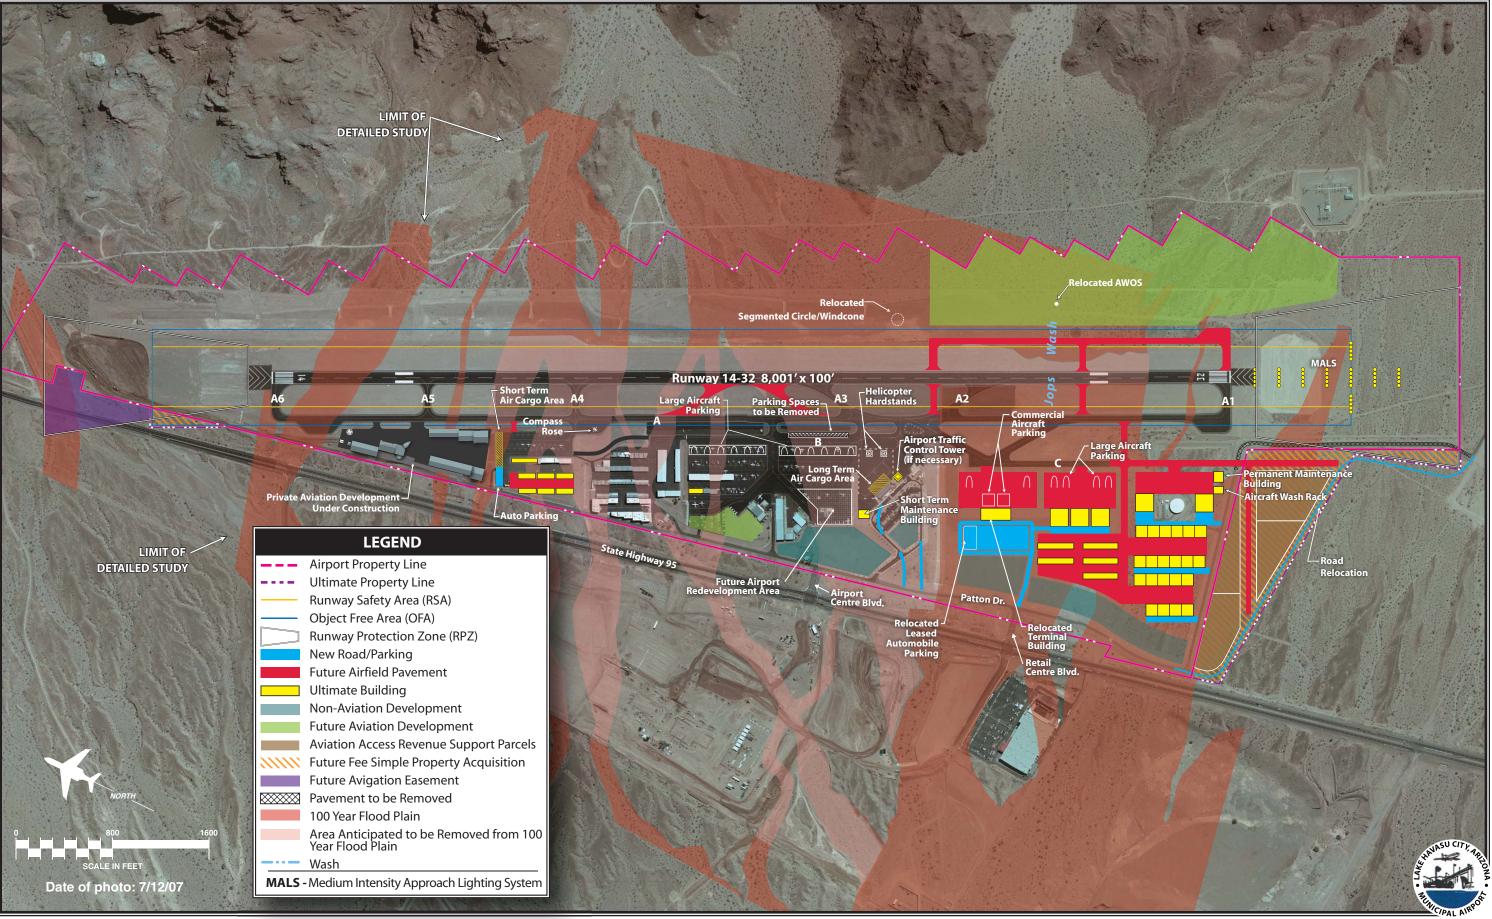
B MASTER PLAN CONCEPT WITH FLOOD PLAINS
